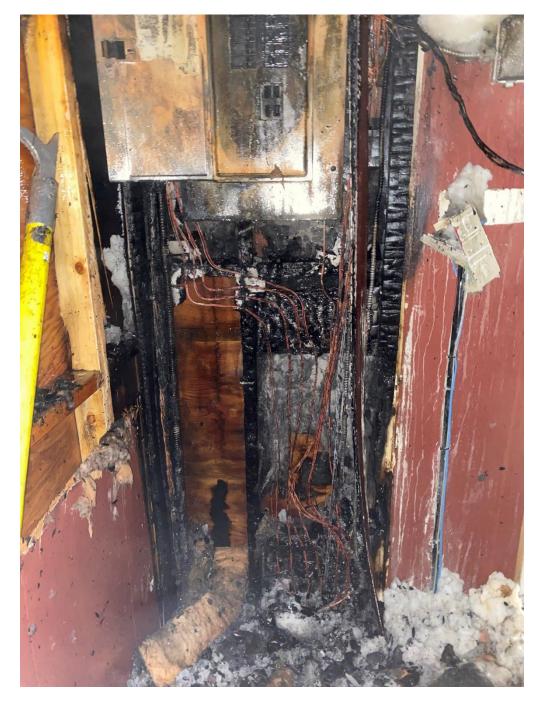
Shows wiring was installed to cross bracing near floor, limiting available wiring space for fished wires. Insulation is in place behind wires in wall, behind cross brace, higher up the wall, below the panel
